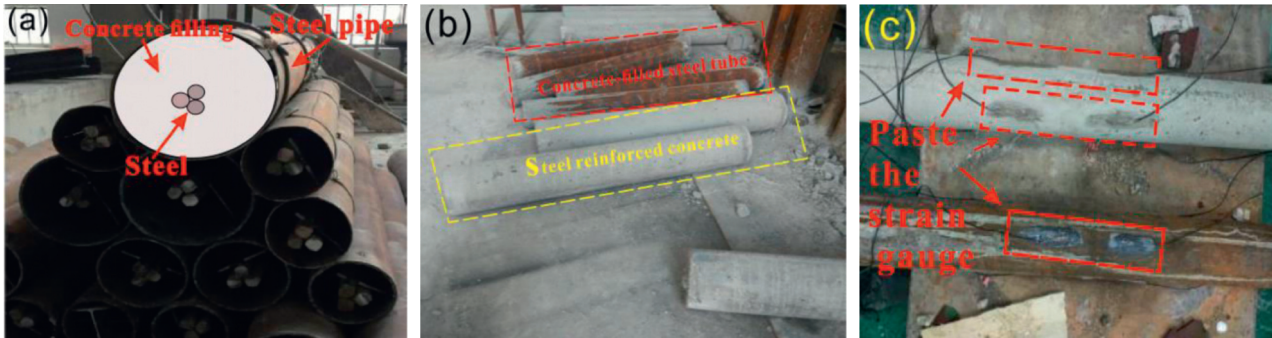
Fabrication of the test loading specimen. (a) Making of test pieces. (b) LGH and GGH of the specimen. (c) Pasting the strain gauge.
